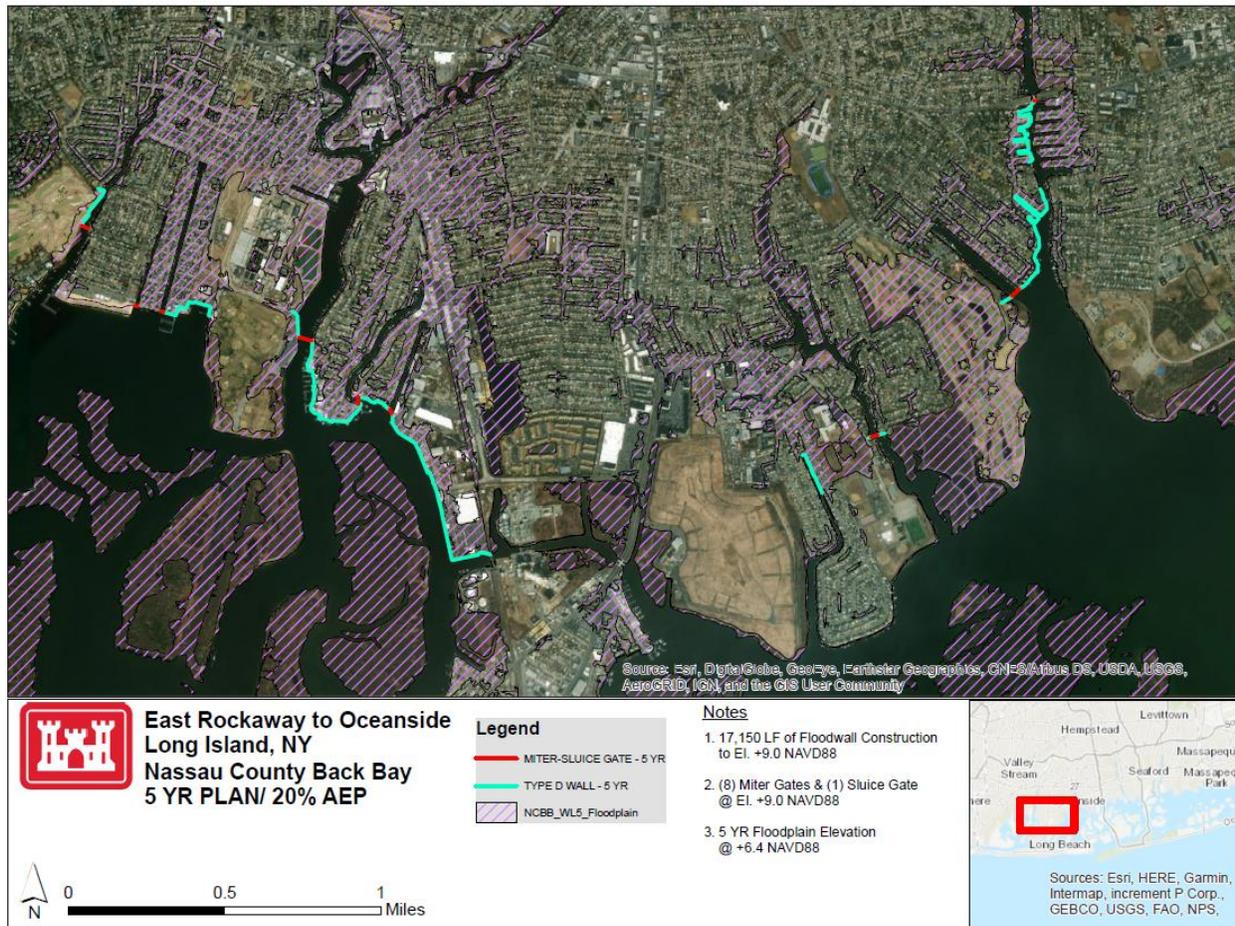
East Rockaway to Oceanside 20% AEP Plan – C2 (Courtesy of USACE-NAP)
